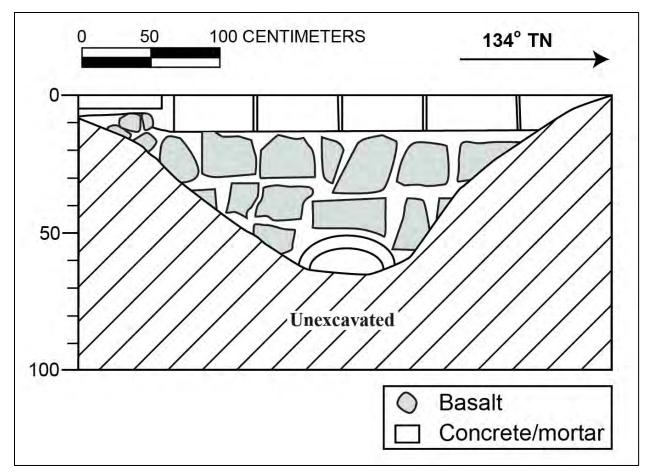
SIHP # 50-80-09-2268 Feature E southwest face of culvert profile
